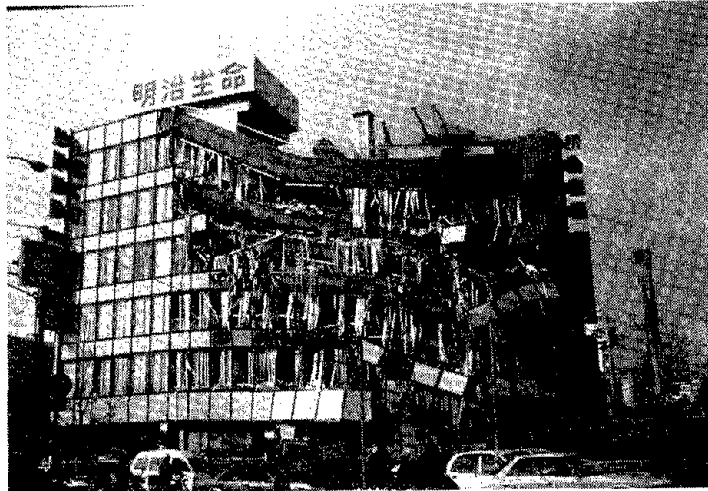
Partial collapse of mid-rise reinforced concrete building
